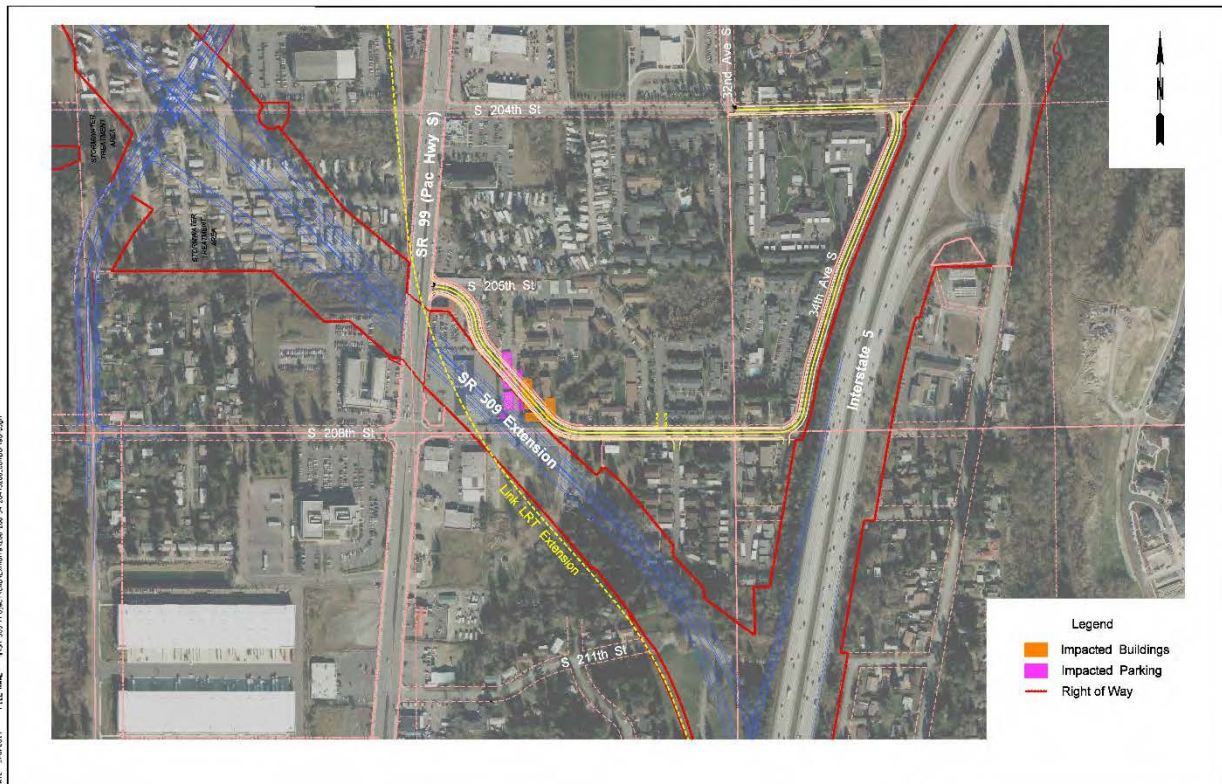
Local Street Alignment at S 206th Street and 34th Avenue S
